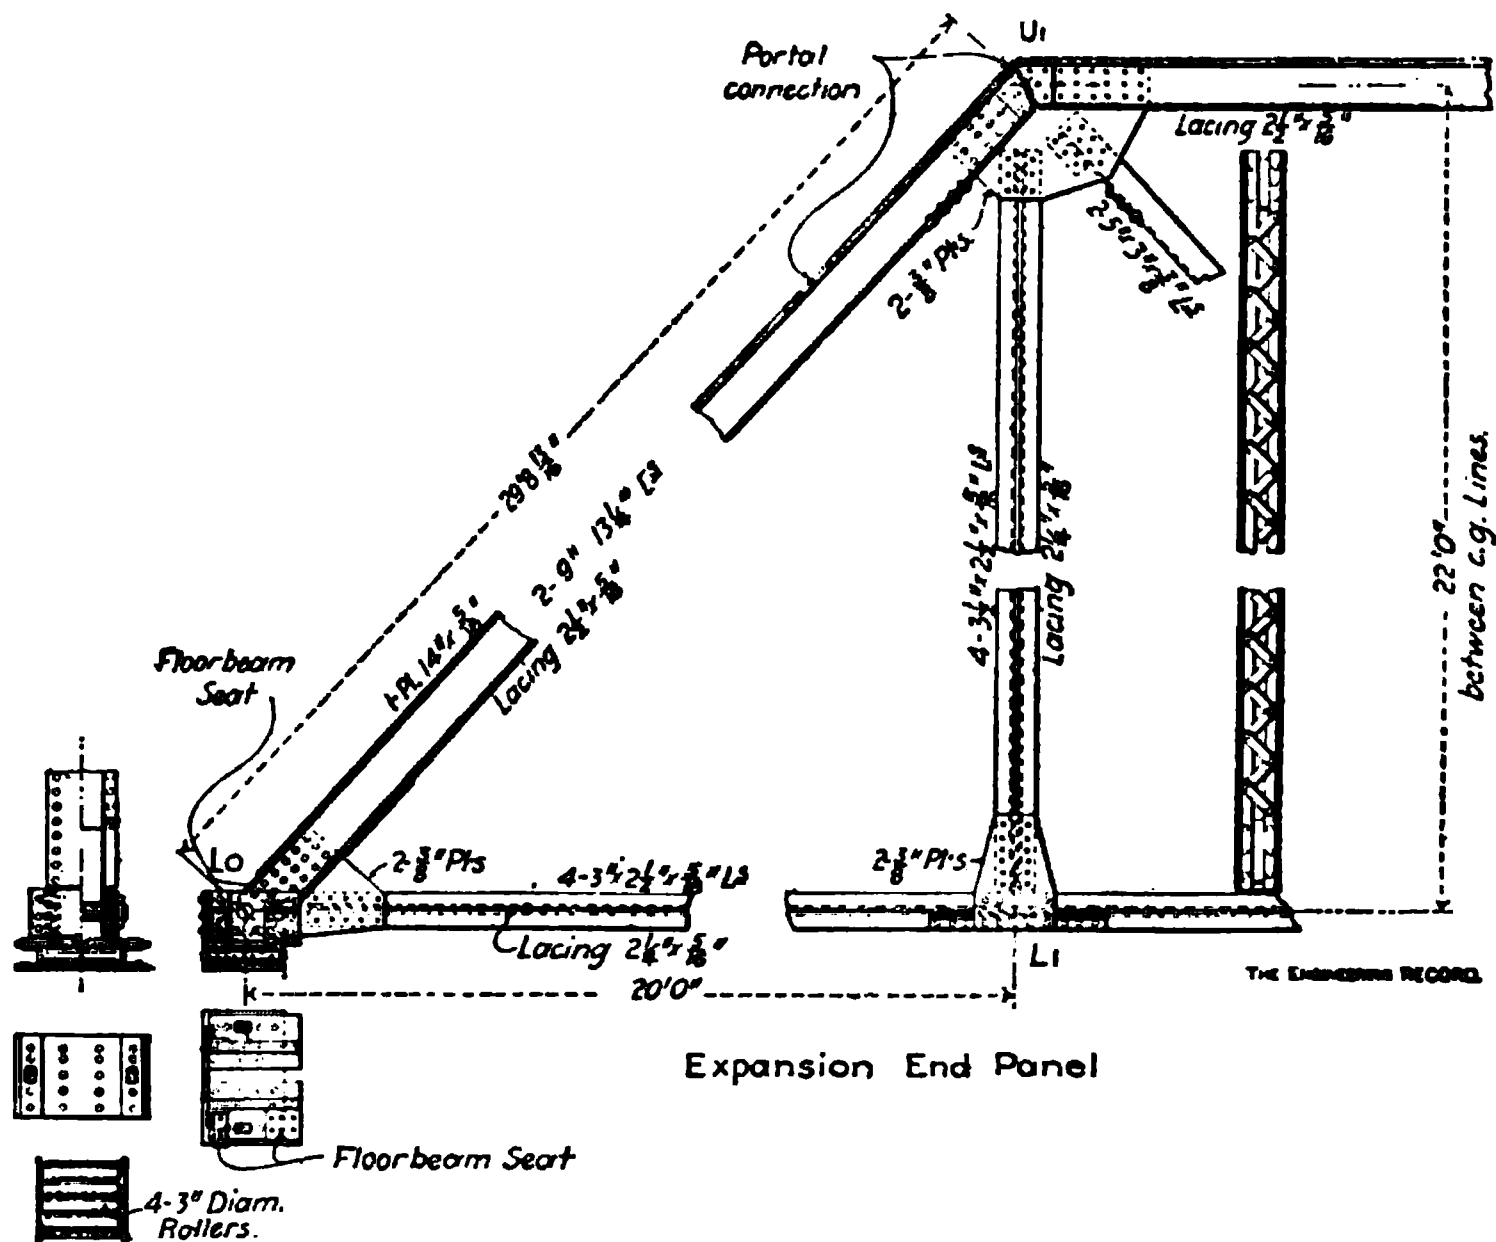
THROUGH RIVETED PRATT ELECTRIC RAILWAY BRIDGE.
